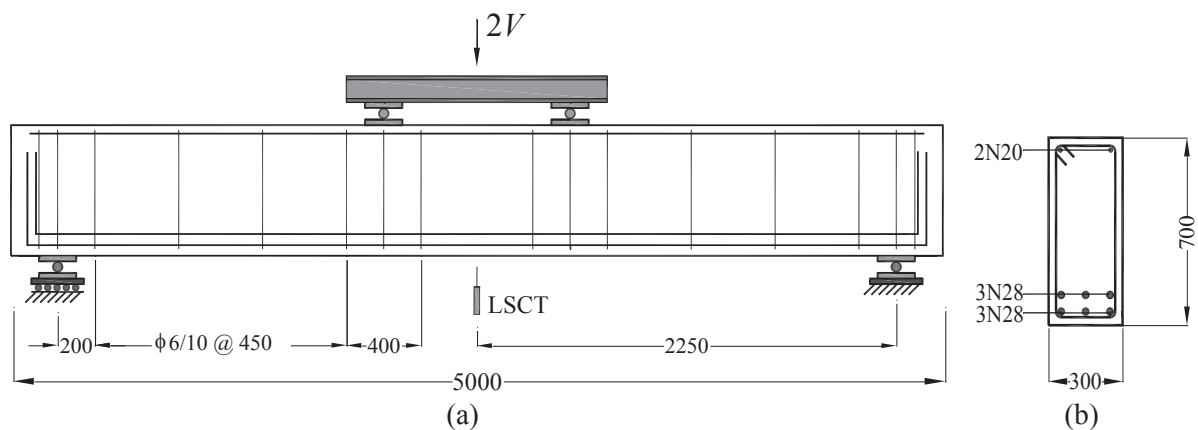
Specimen dimensions (in mm): (a) Test setup; (b) Cross section
